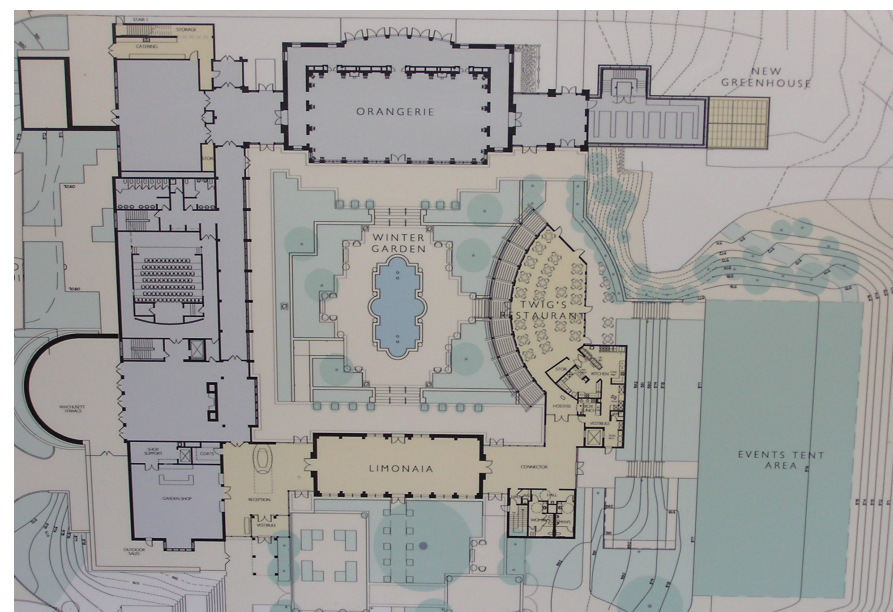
Site Masterplan showing recent improvements (blue) with proposed additions (yellow). Source: Tower Hill Botanical Garden.
